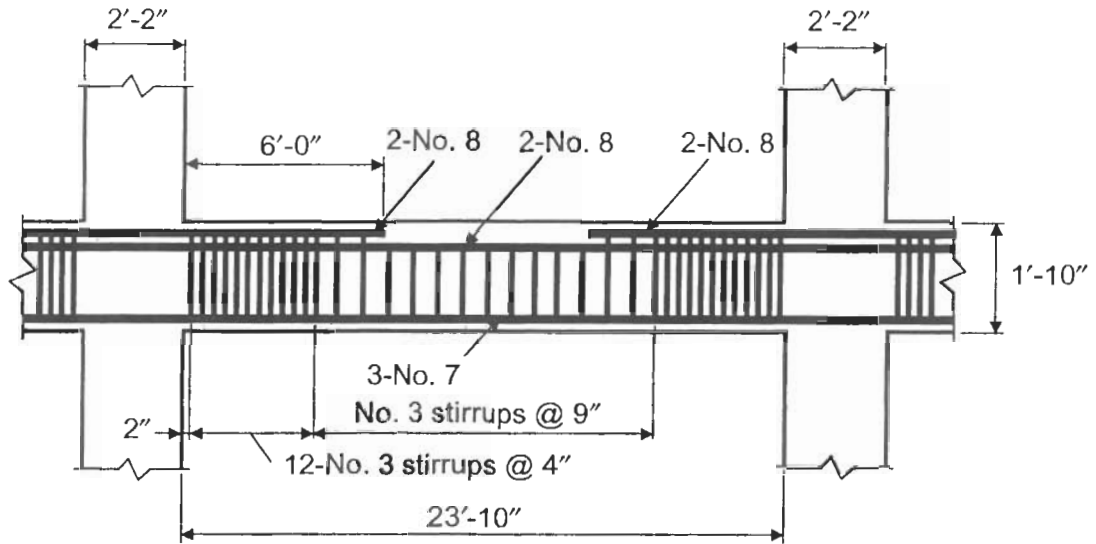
Reinforcement Details for Beam C4-C5 at the 2<sup>nd</sup> Floor Level (SDC C)
